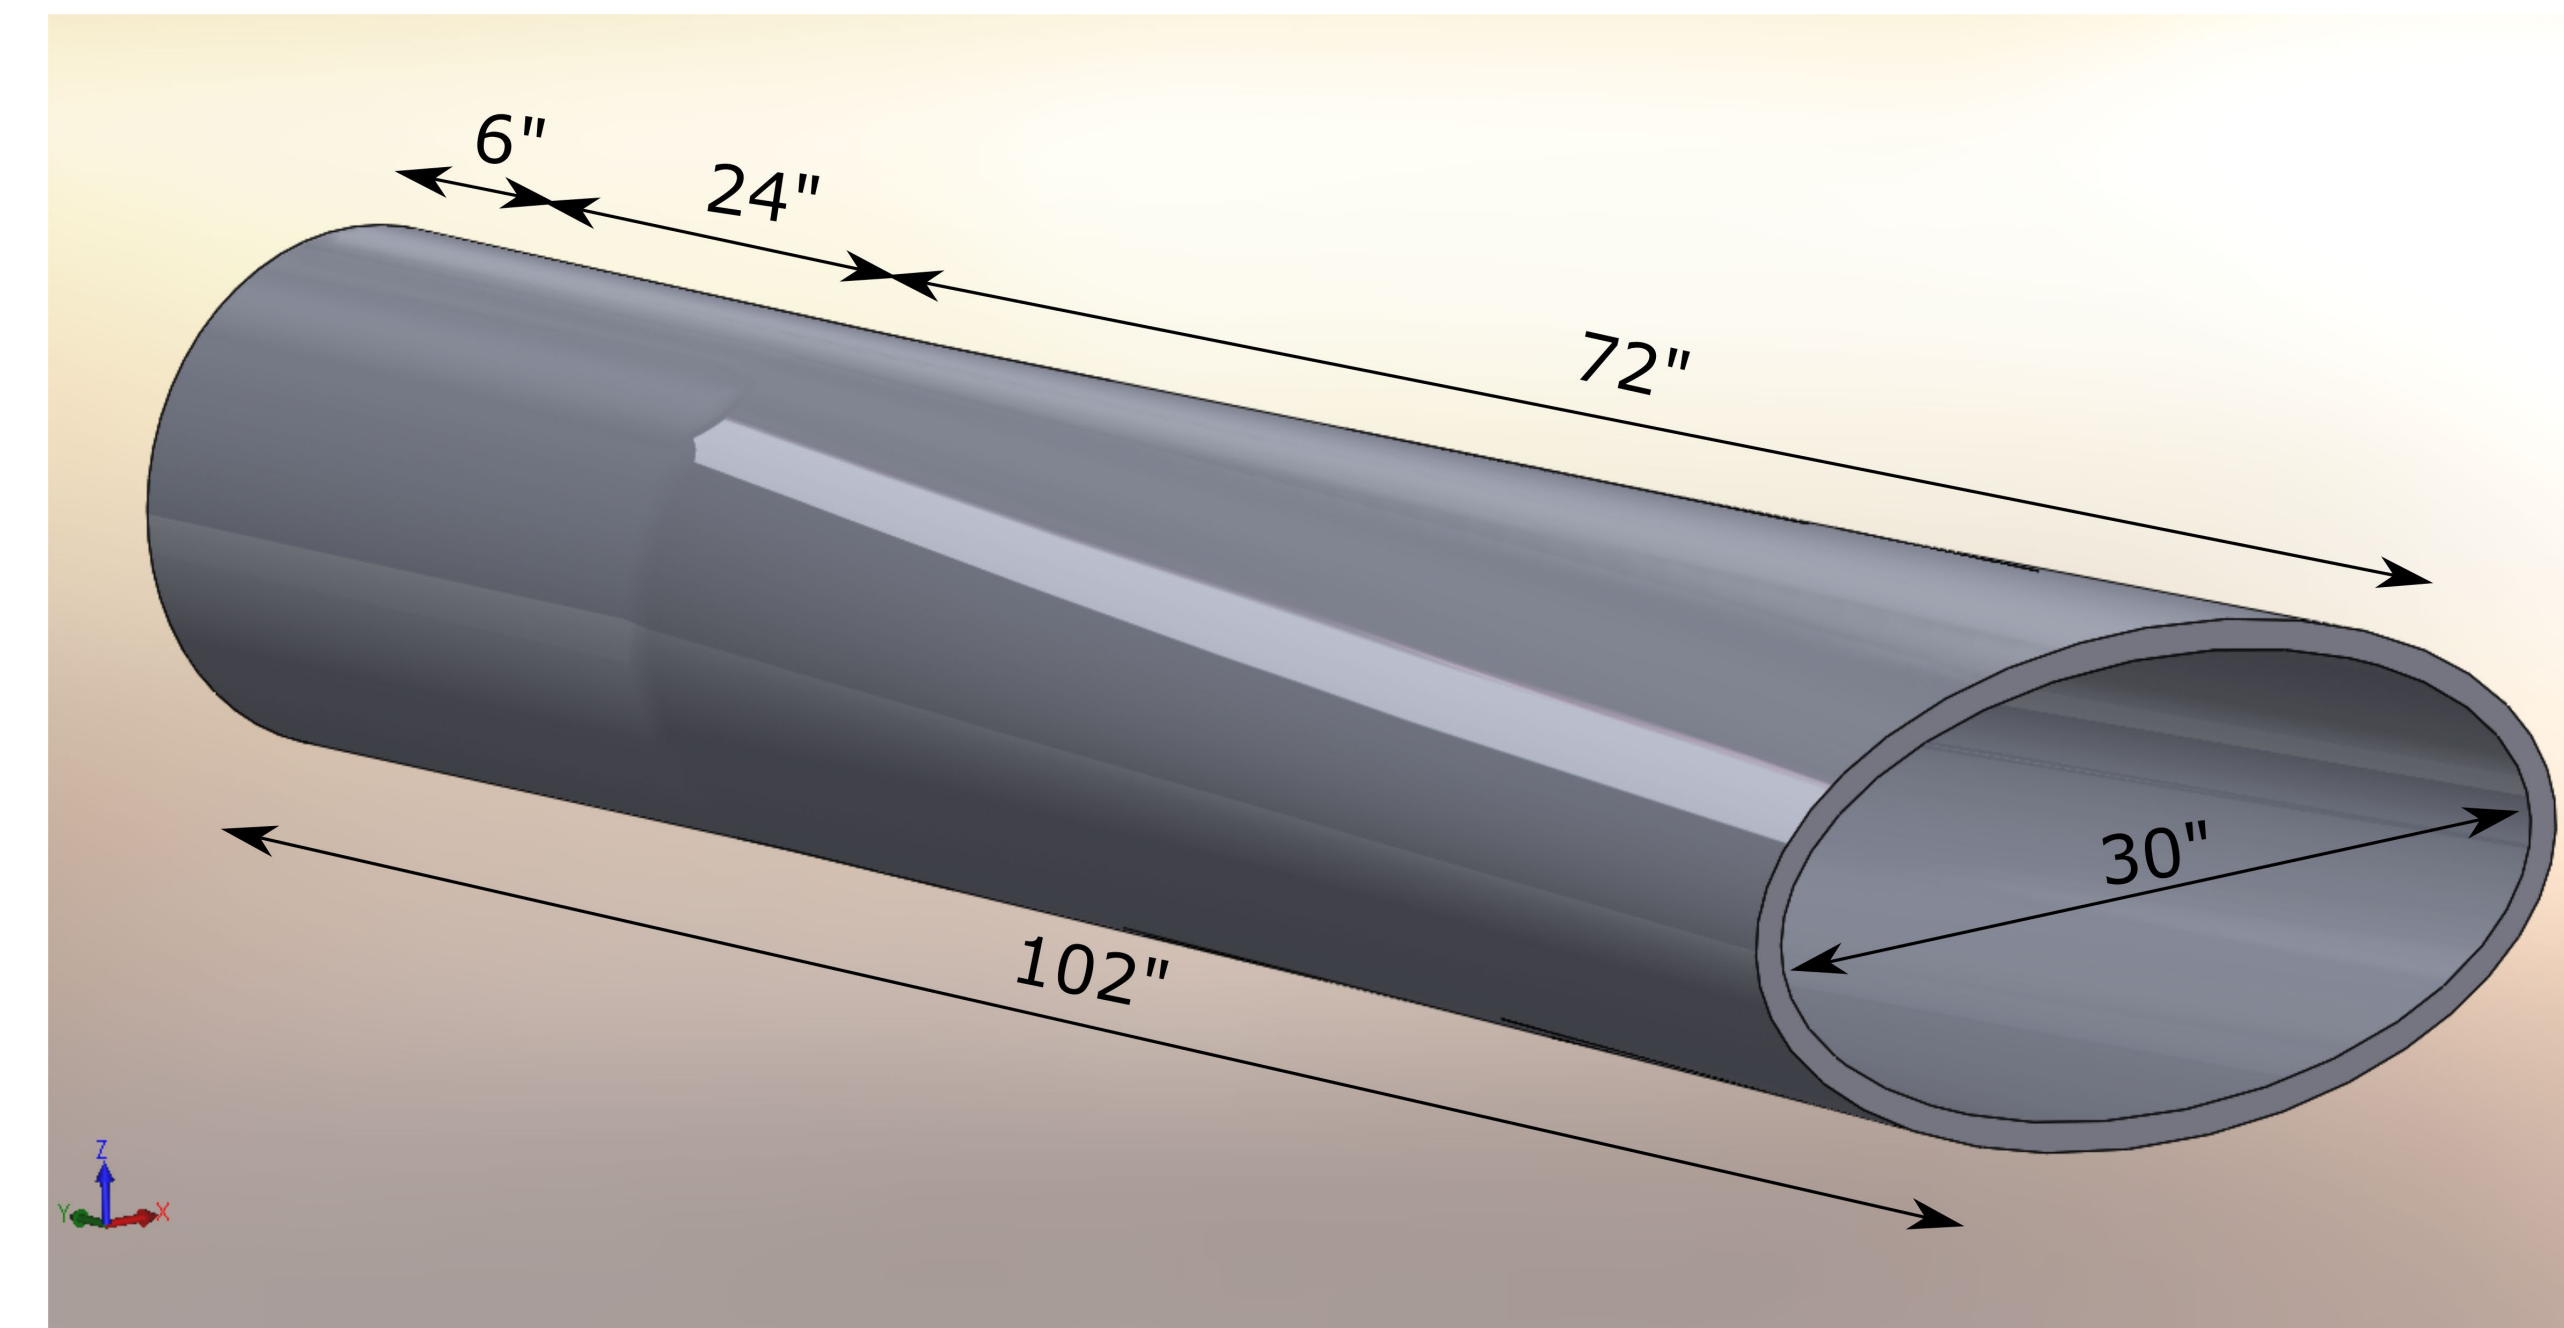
D model of the diffuser to be tested at Thorndike, ME culvert site.
